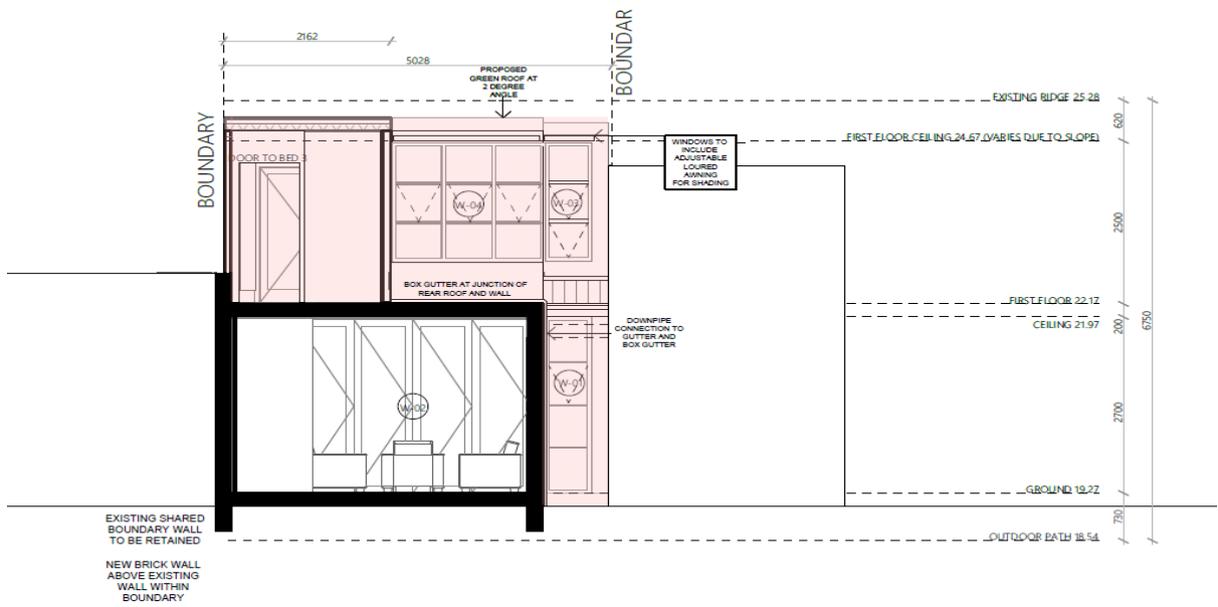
Proposed West Internal Elevation (extent of new works outlined in red)
